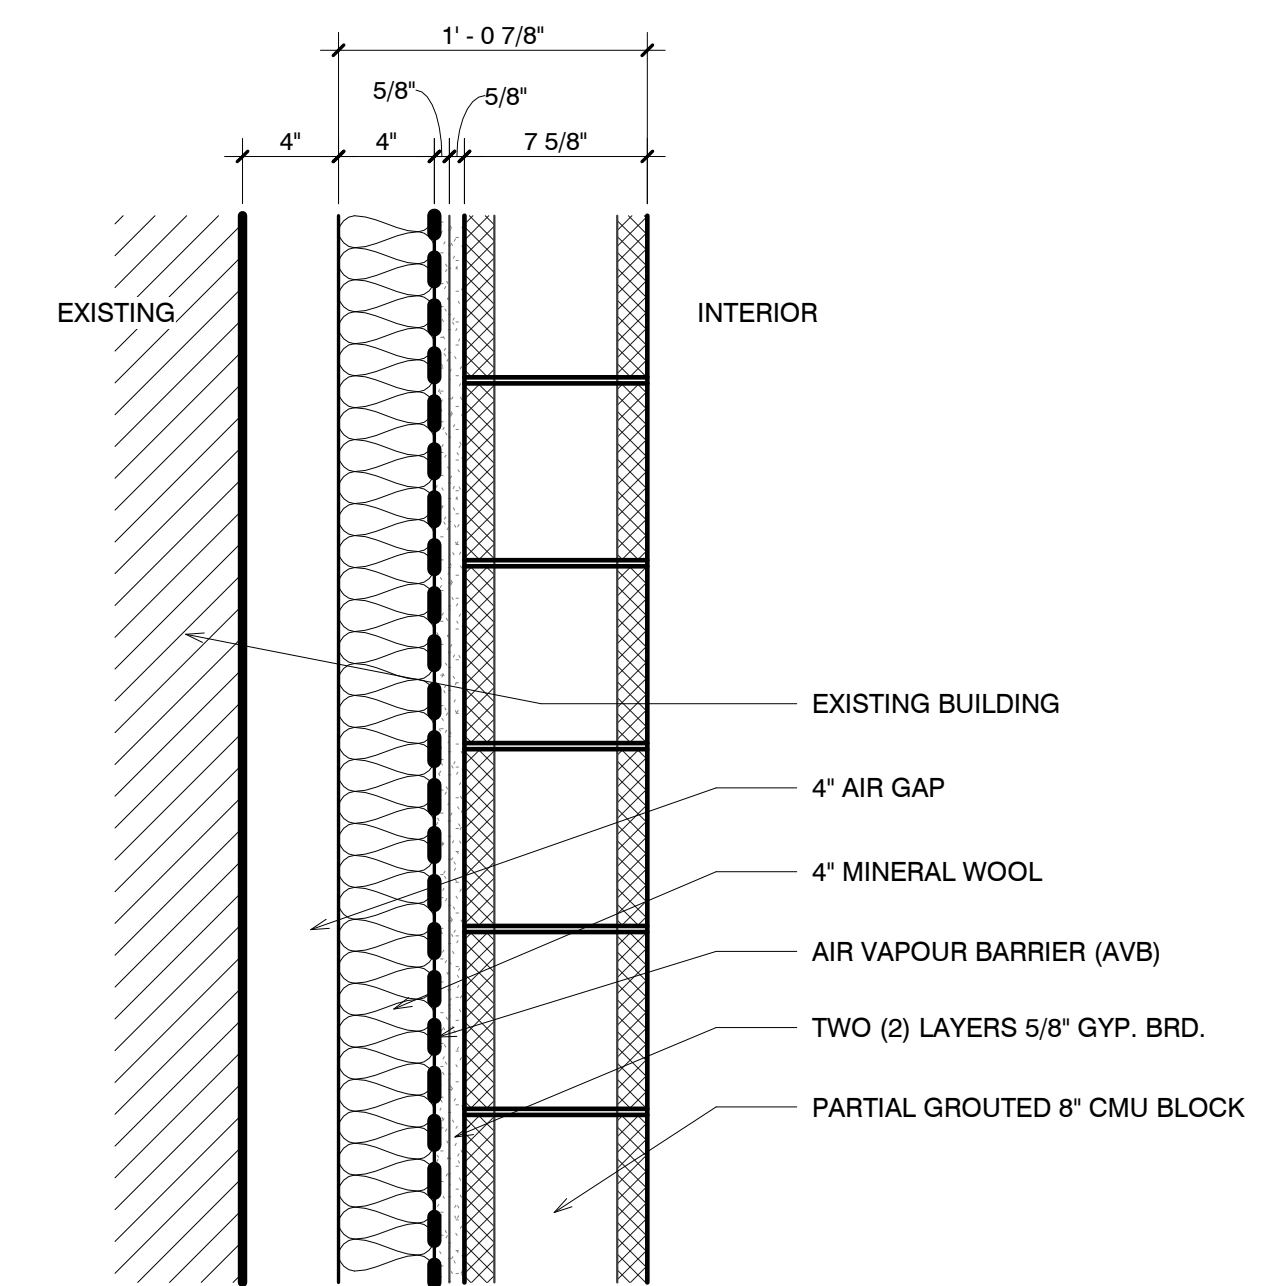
DETAIL - SHEAR WALL - 4 HOUR (C5) 7
